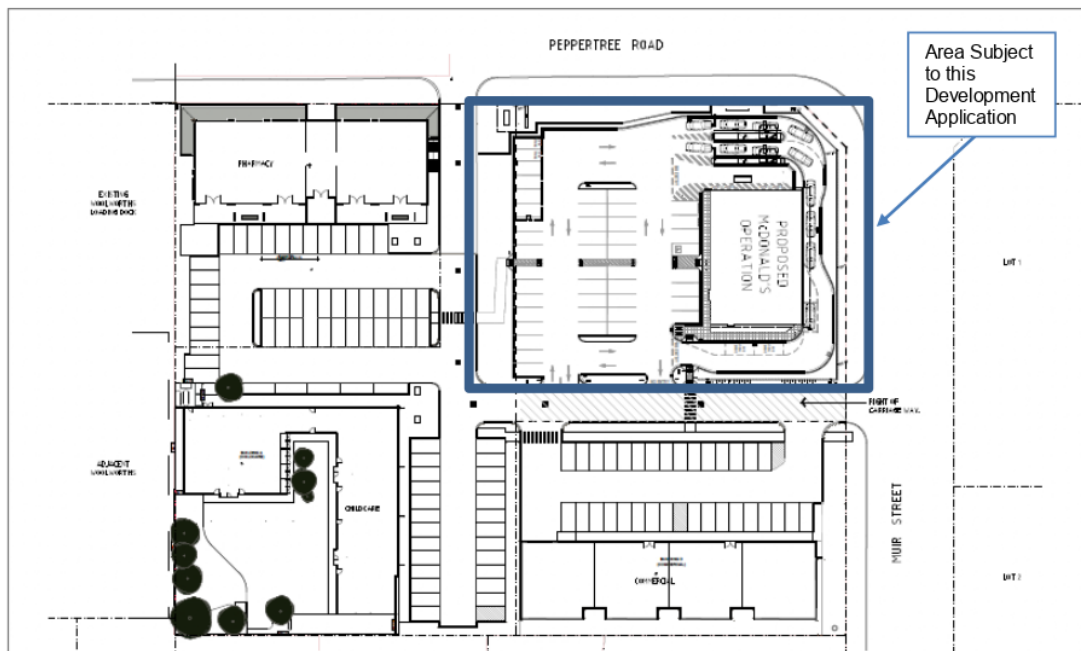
Overall Site Plan showing the mixed use development associated with DA16-2019-445-1, including a childcare centre, medical centre, pharmacy, and commercial buildings.
